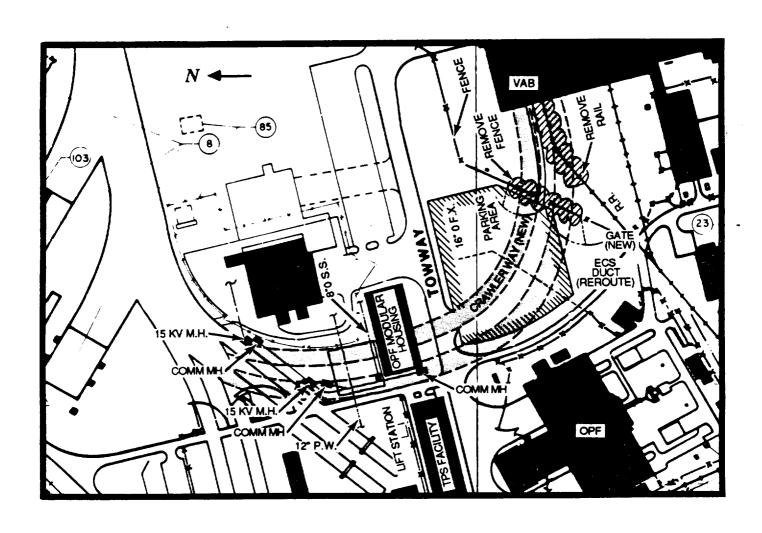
VAB HB-4 Crawlerway Site Plan.
